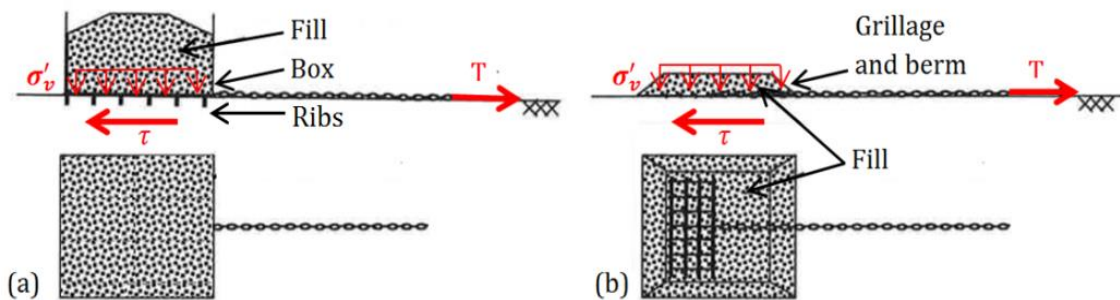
Surface gravity anchor: (a) box anchor, (b) grillage and berm anchor [36]
